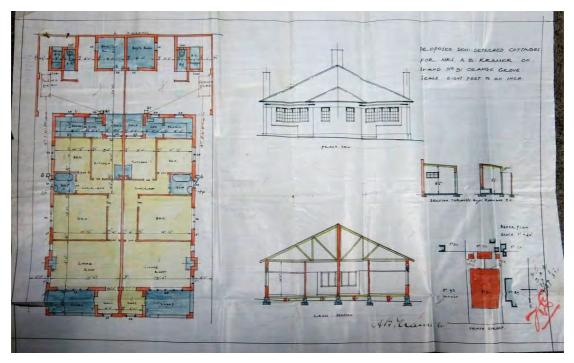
Plan for proposed semi-detached cottages, Stand 91 (Source: City Council of Johannesburg, Plans Archive)
